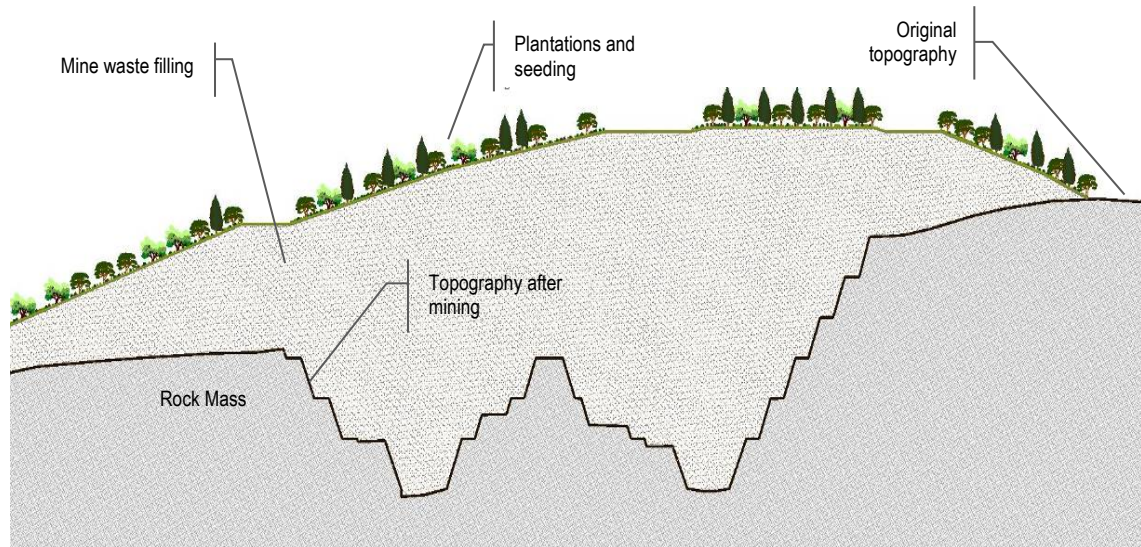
Cross-section of landscape recovery in open pits with filling solution and waste installation.
